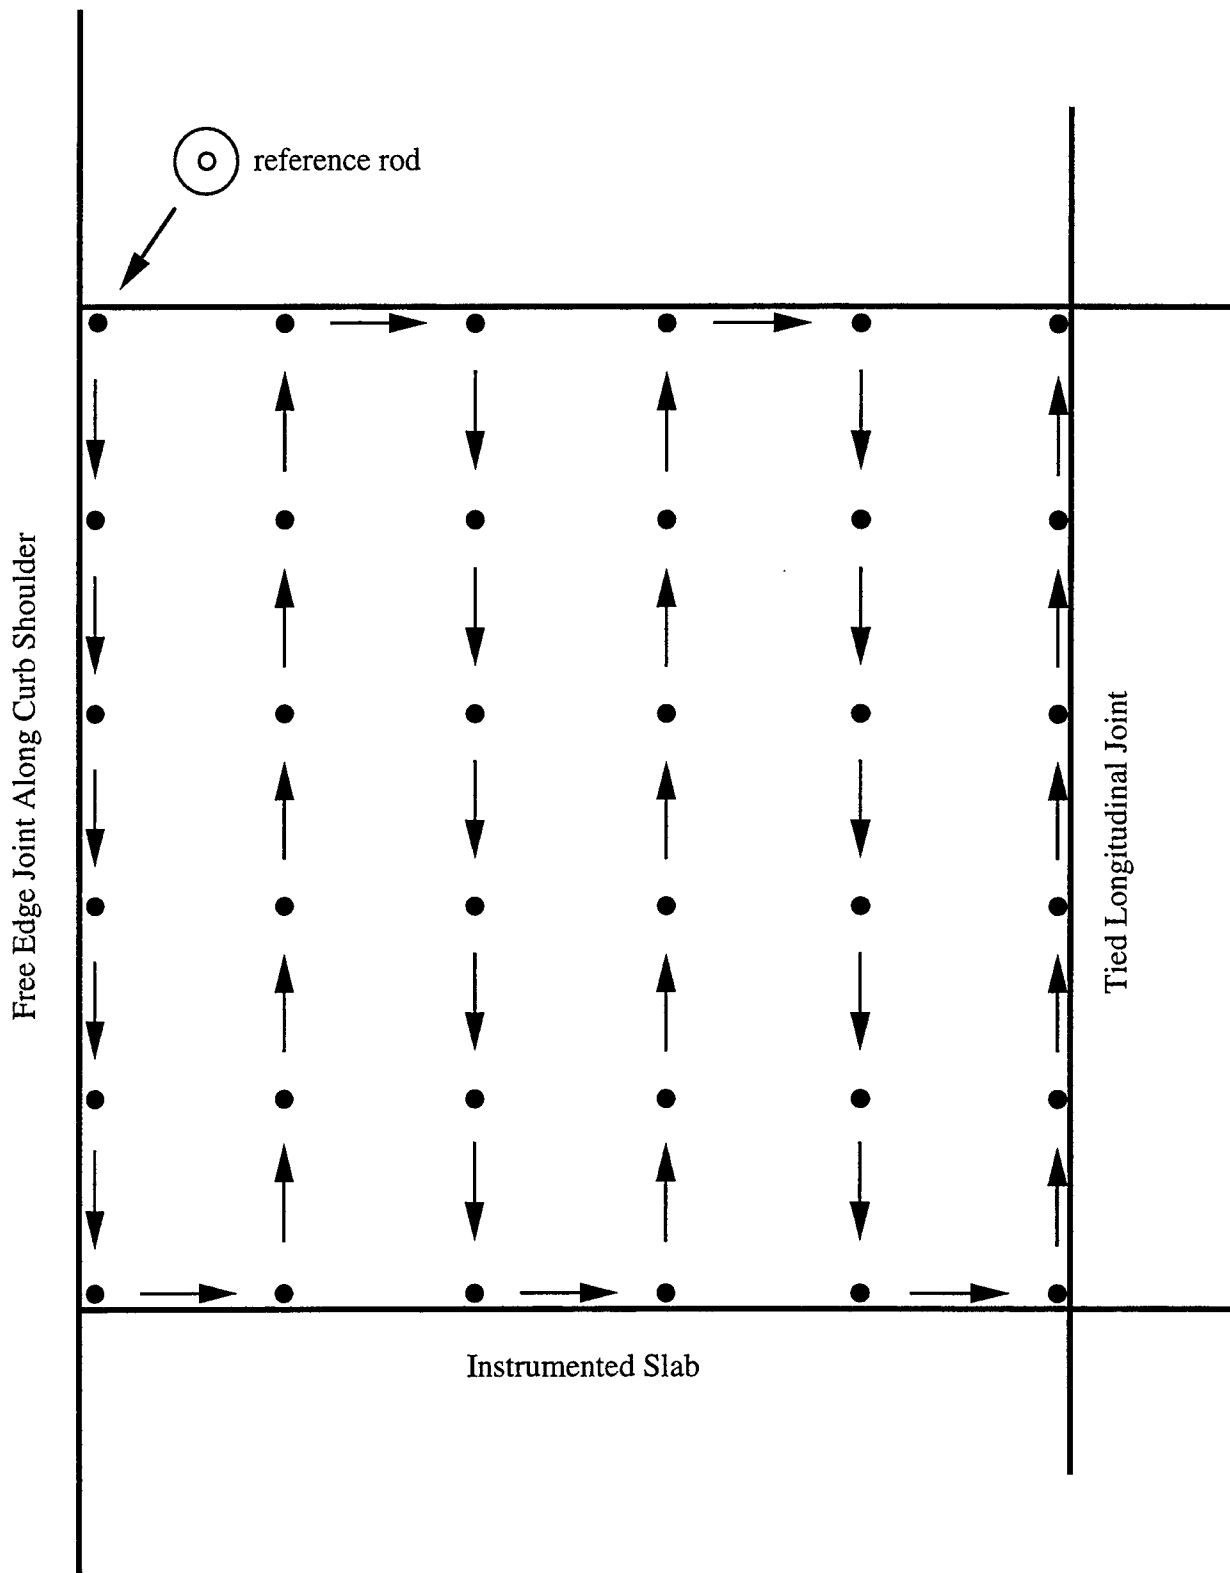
Typical Dipstick Profile Layout for CDOT Project #1.
